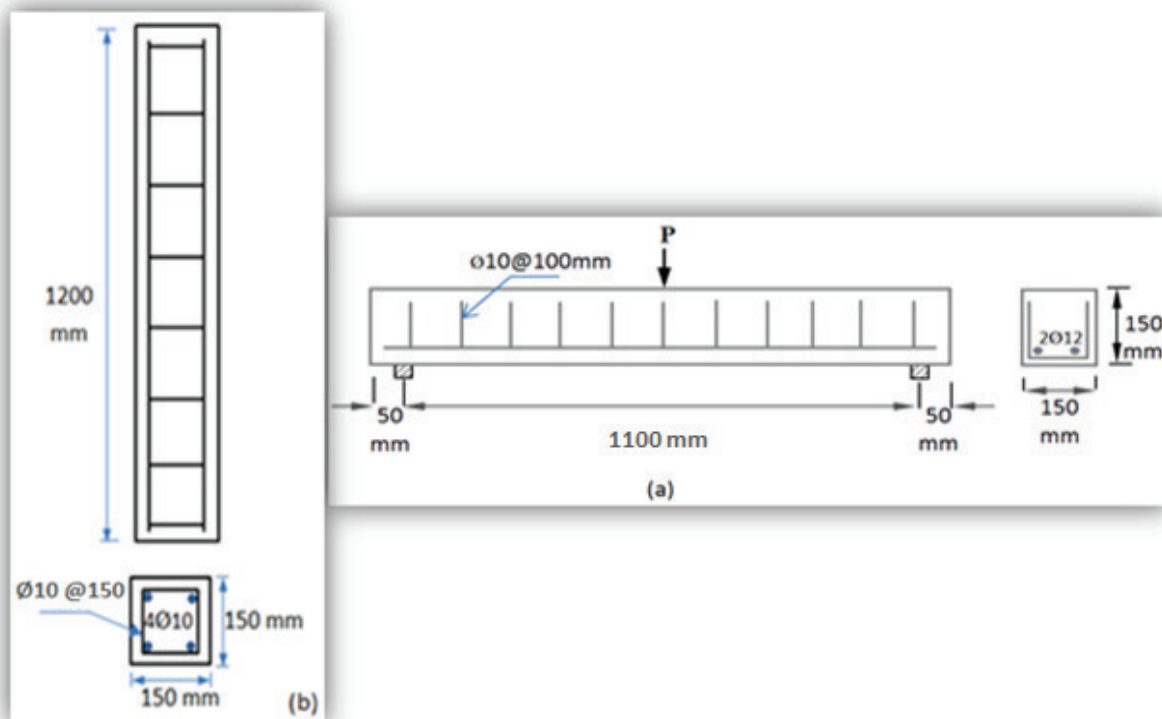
Geometry and reinforcement detail for (a): Beams, (b): Columns
